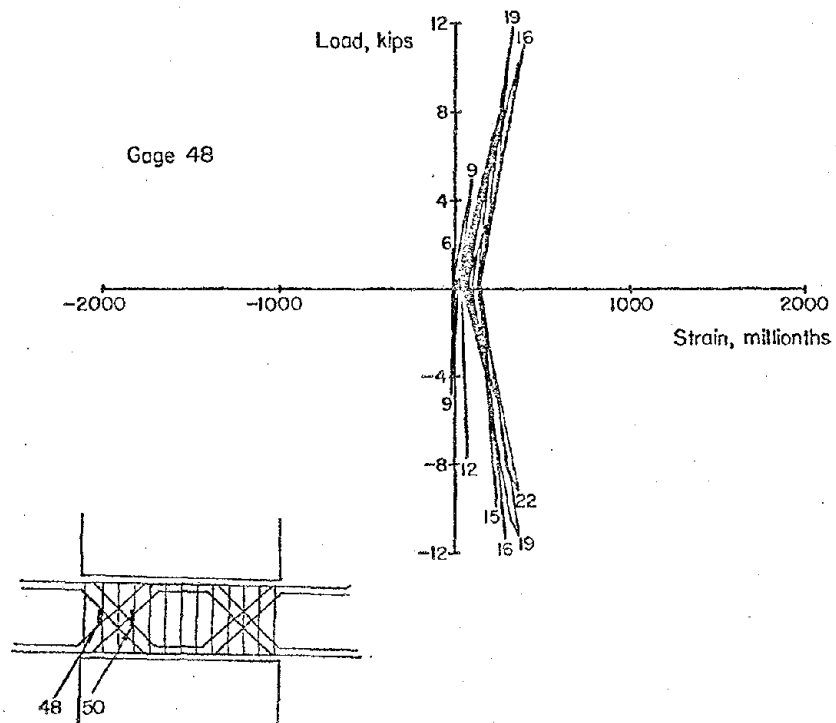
Load versus Stirrup-tie Steel Strains for Specimen C3 (East Beam)
